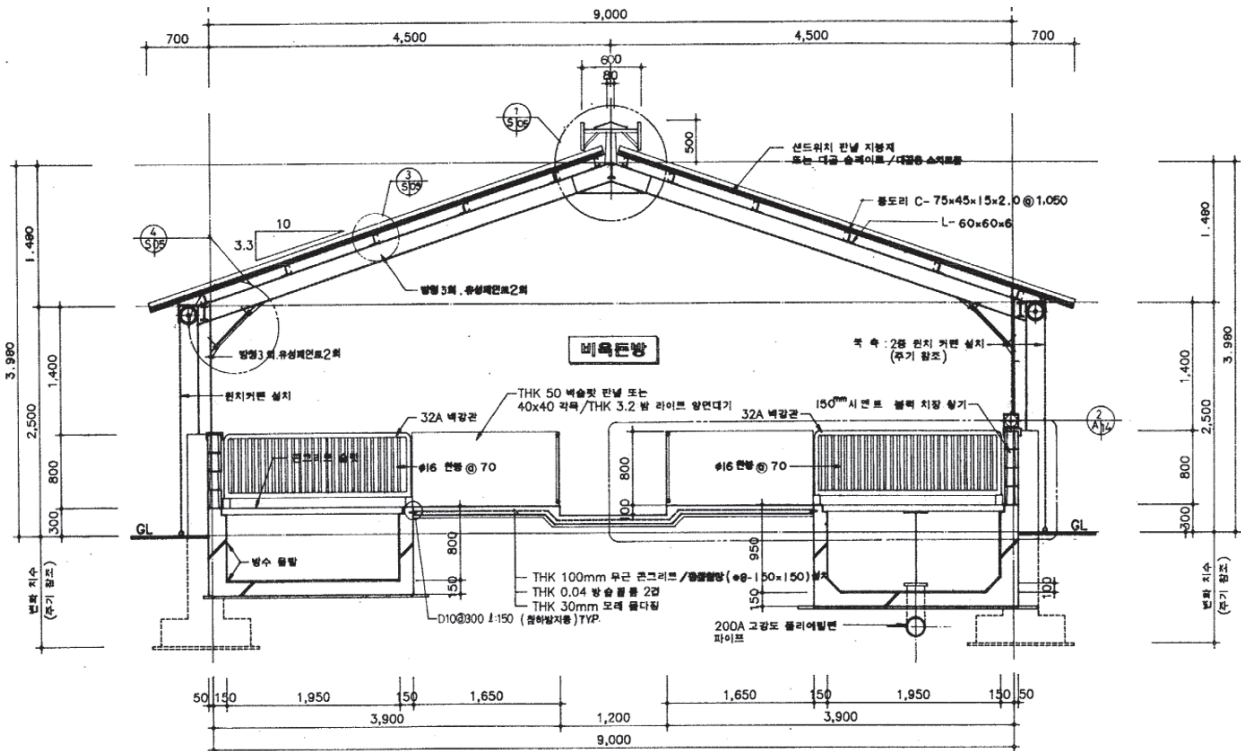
Example drawing of 1<sup>st</sup> generation design standard with livestock house (MAFRA · NH, 1993, Longitudinal section of fattening pig house)
